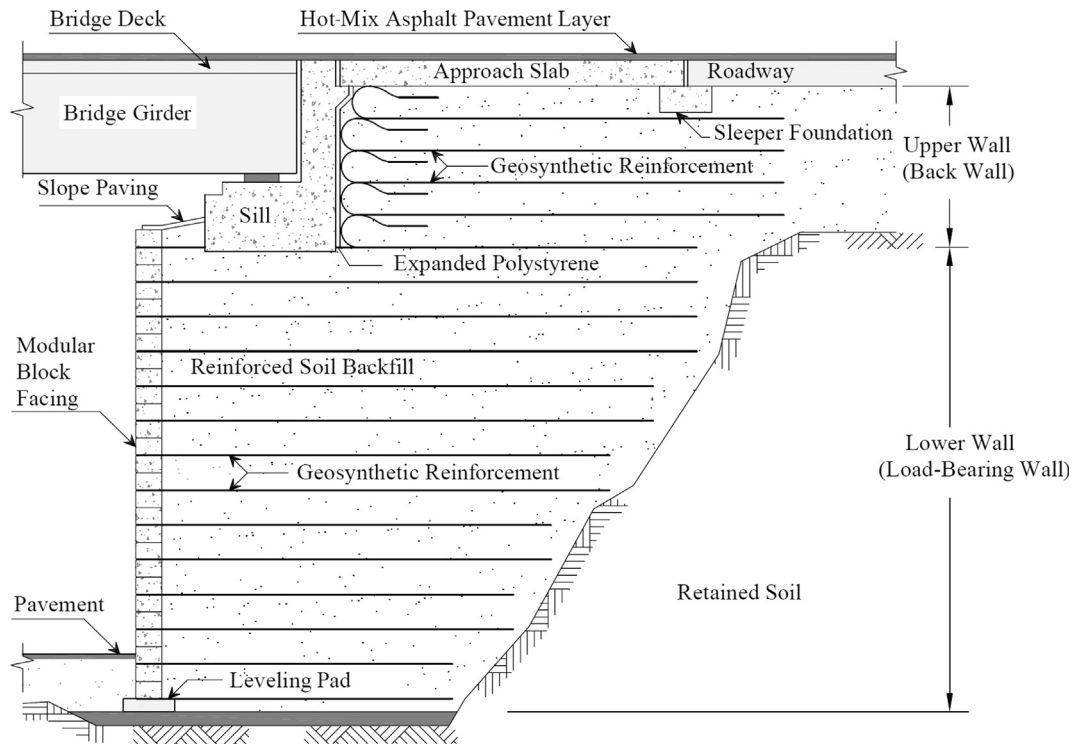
Typical GRS bridge abutment system with modular concrete block facing.
